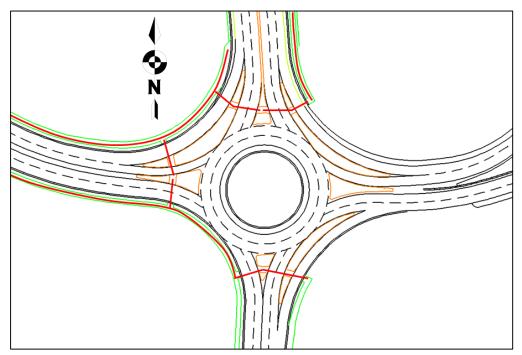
South Roundabout Pedestrian Access (Alloy Consulting Ltd., 2015)
